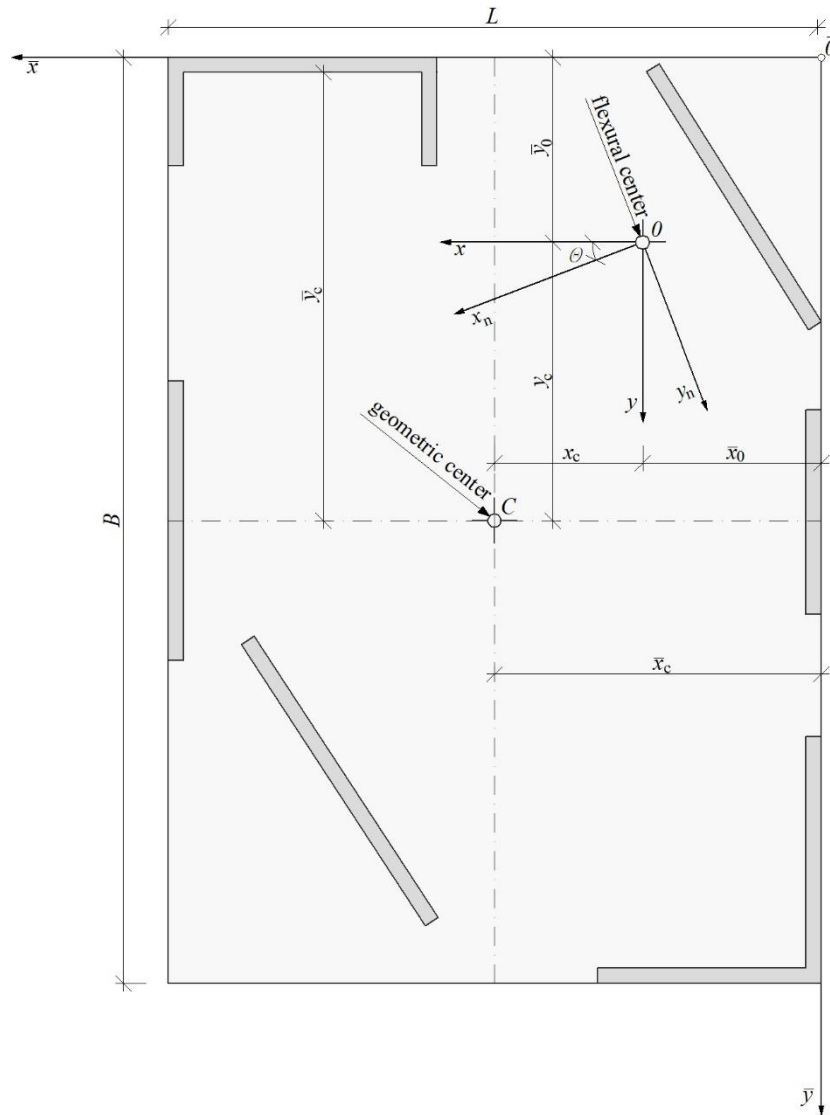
Layout of an asymmetric building with shear walls and thin-walled open cross sections columns, according to [114]
